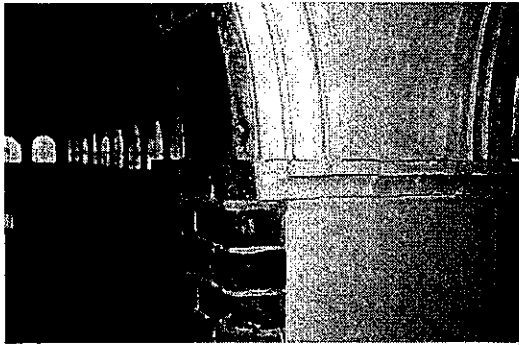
Interior, Landing & Stairs (space FF12). Detail of archway showing damaged/missing projecting brick and plaster cornices.
